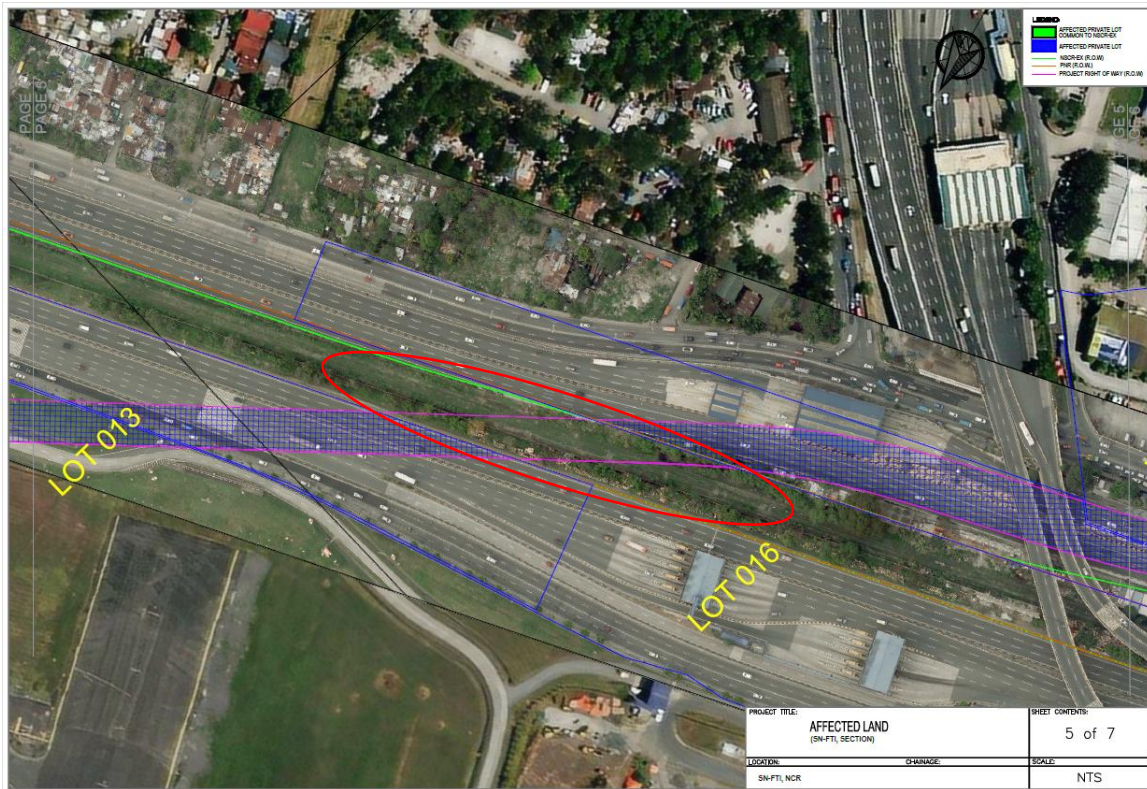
Lots of the Overlap Section of Makati-Buli mainline and Tunnel Section
